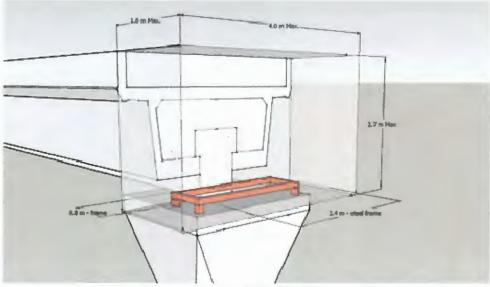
Art plinth structural frame and overall space allowances and dimensions for artwork.
